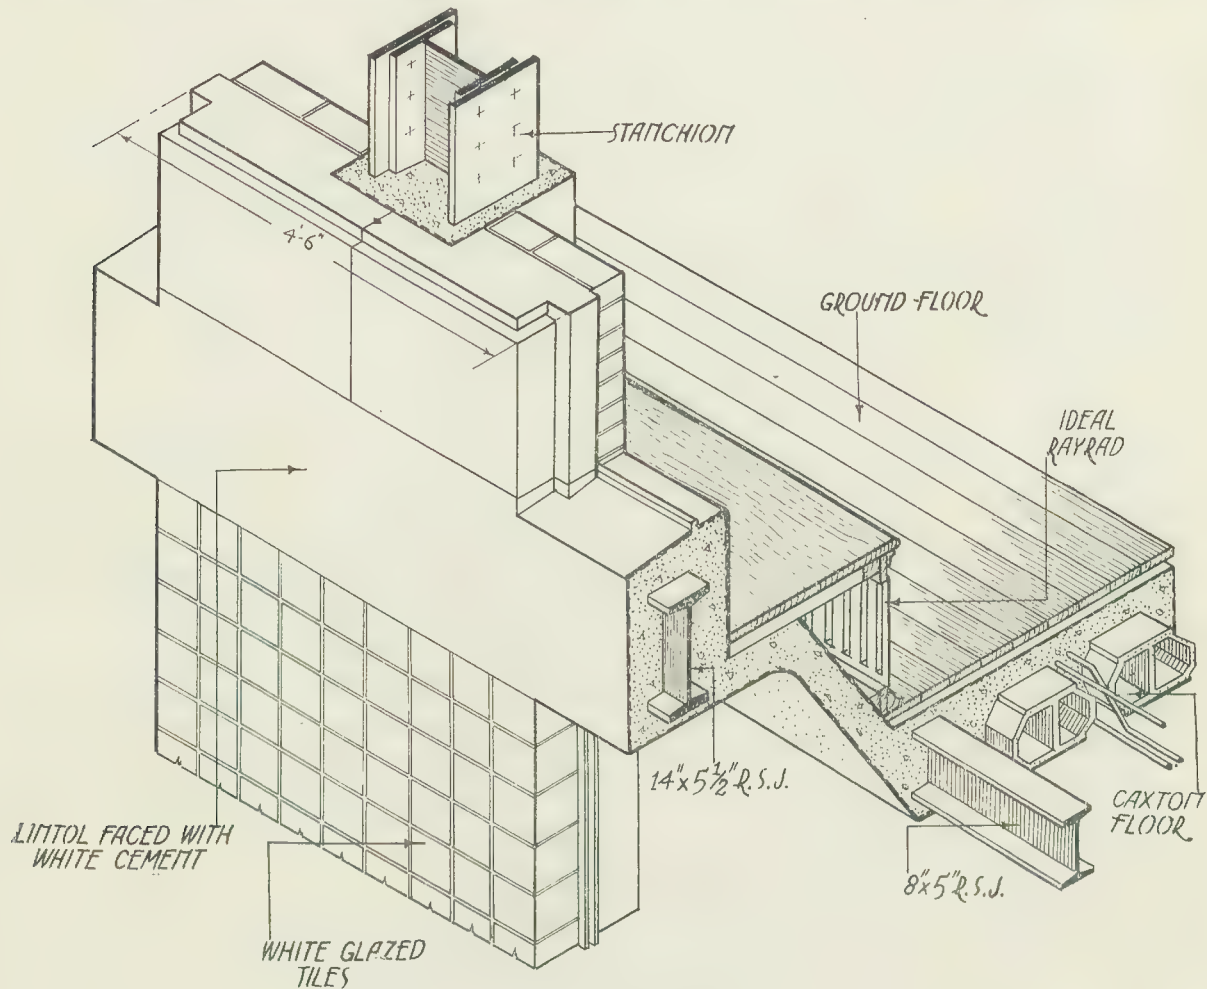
CONSTRUCTION OF EXTERNAL BASEMENT WALL WHERE VERTICAL WINDOWS ARE DESIRED
